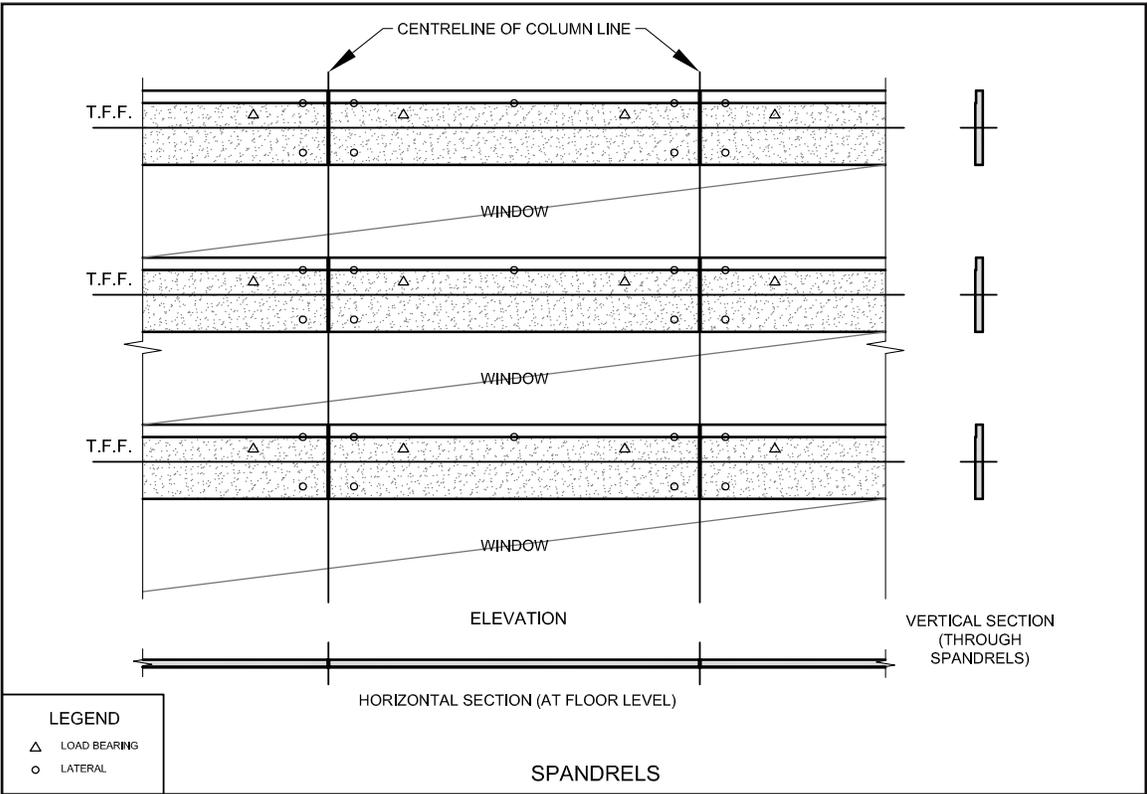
Precast spandrel panels. Source: M. E. Hachborn Engineering
